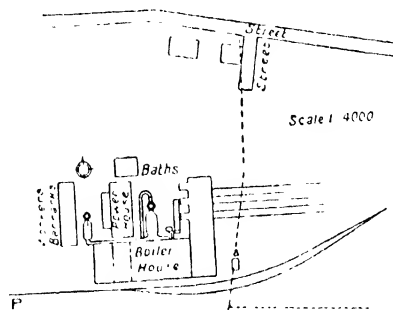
Ground plan of the briquette factory and the power installation of the Akt.-Ges. Lauchhammer, Lower Lausitz.
